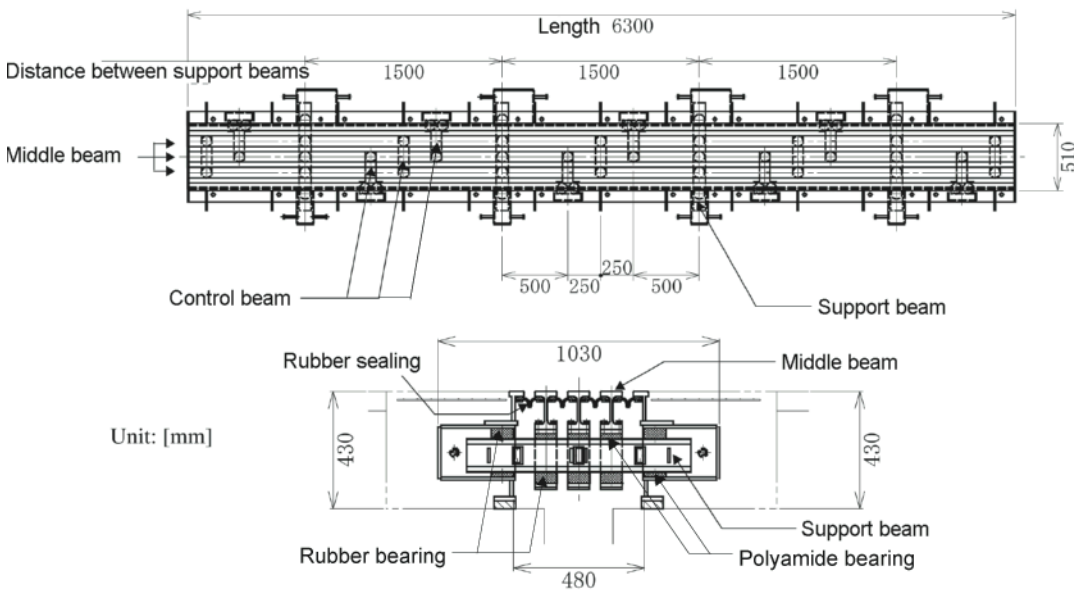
Plan and cross-sectional views of the full-scale joint model.
